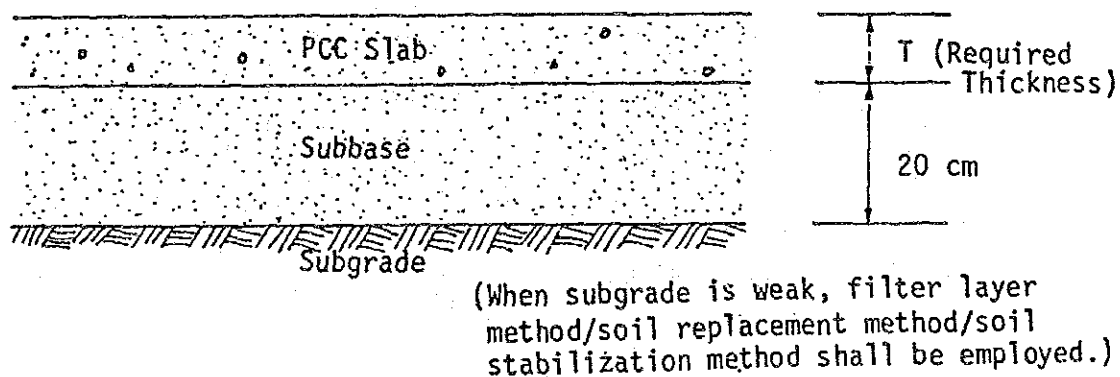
TYPICAL CROSS SECTION OF PCC PAVEMENT
